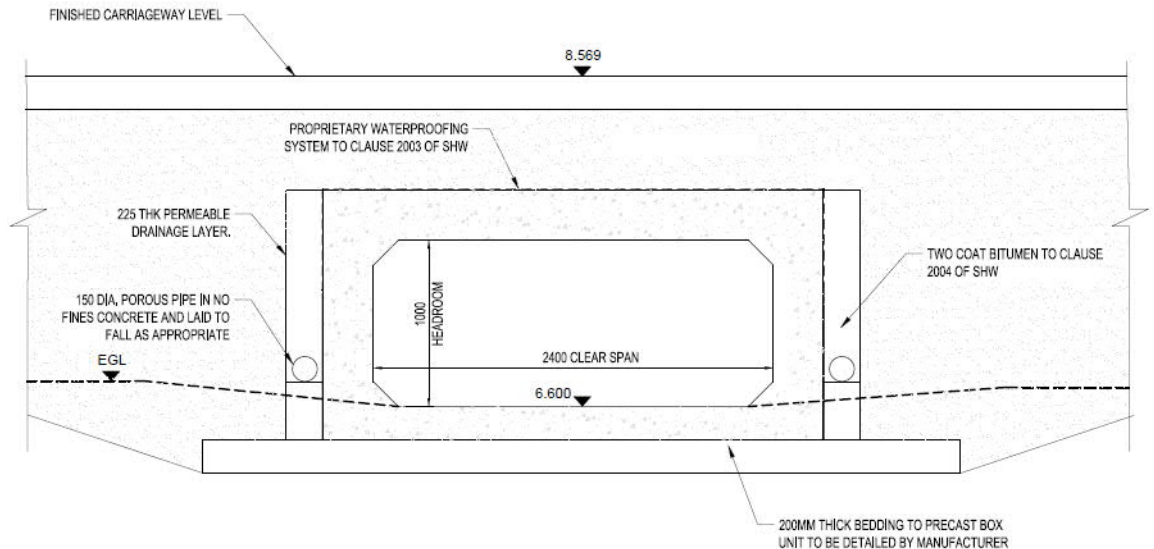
Cross-section of the flood relief culvert at crossing 7 (extract from drawing no. SZC-AD0310-WSP-SLRHDG-ZZ0000-DRW-HCD-300004)
